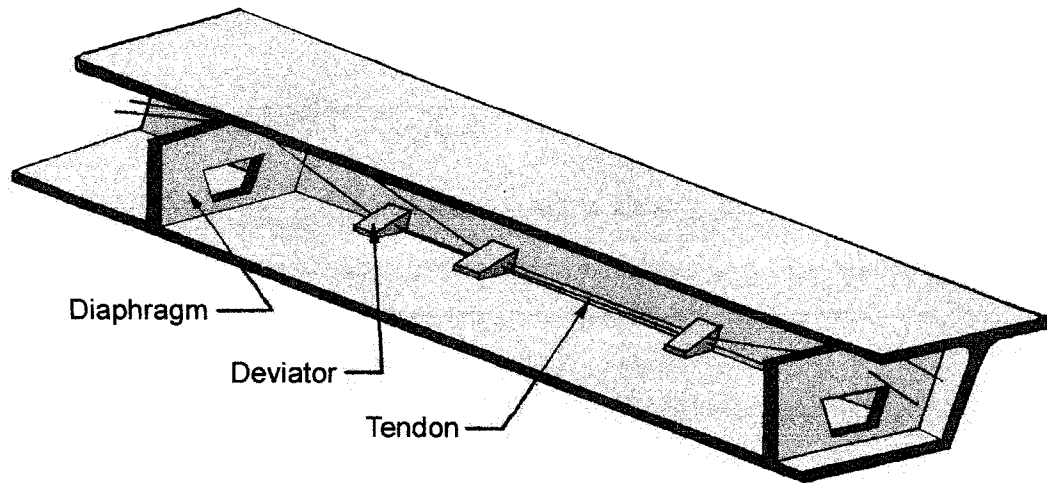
Example of typical external post-tensioning in a box girder (adapted from Macovei-Benczur and Rogowsky, 2002)
